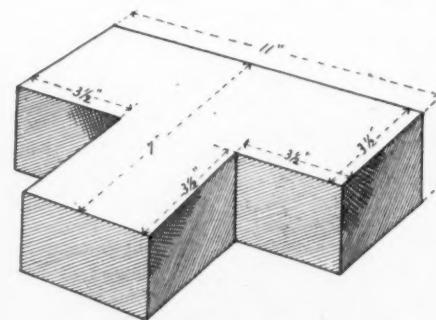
The inventor claims that the pavement only requires a foundation of a few inches of broken stone and a cushion of a couple of inches of sand. Figure 1 shows the dimensions of the Briggs block. Fig. 2 illustrates a constructed roadway. It will be seen that each row bonds
